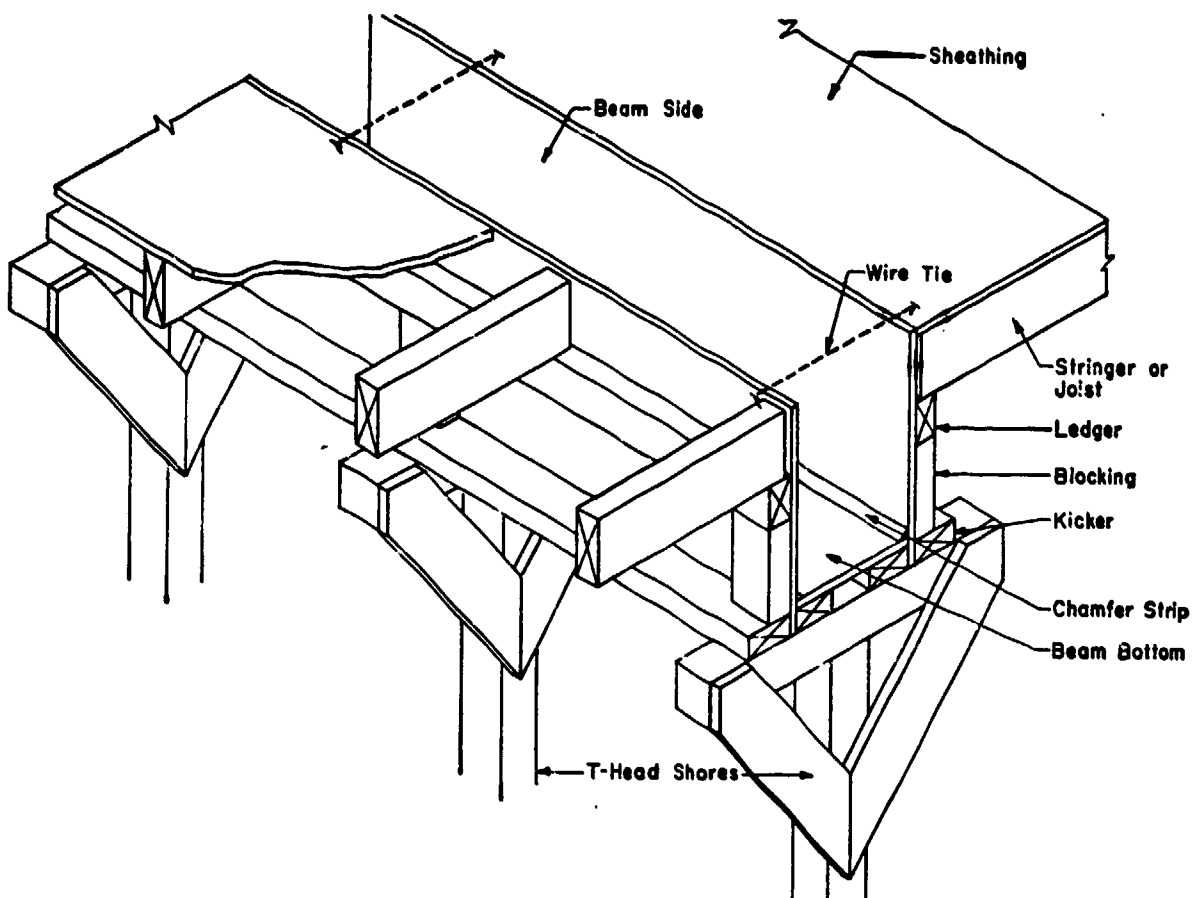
Typical beam form construction showing framing necessary for slab to be placed along with the beam (Courtesy of American Concrete Institute)
